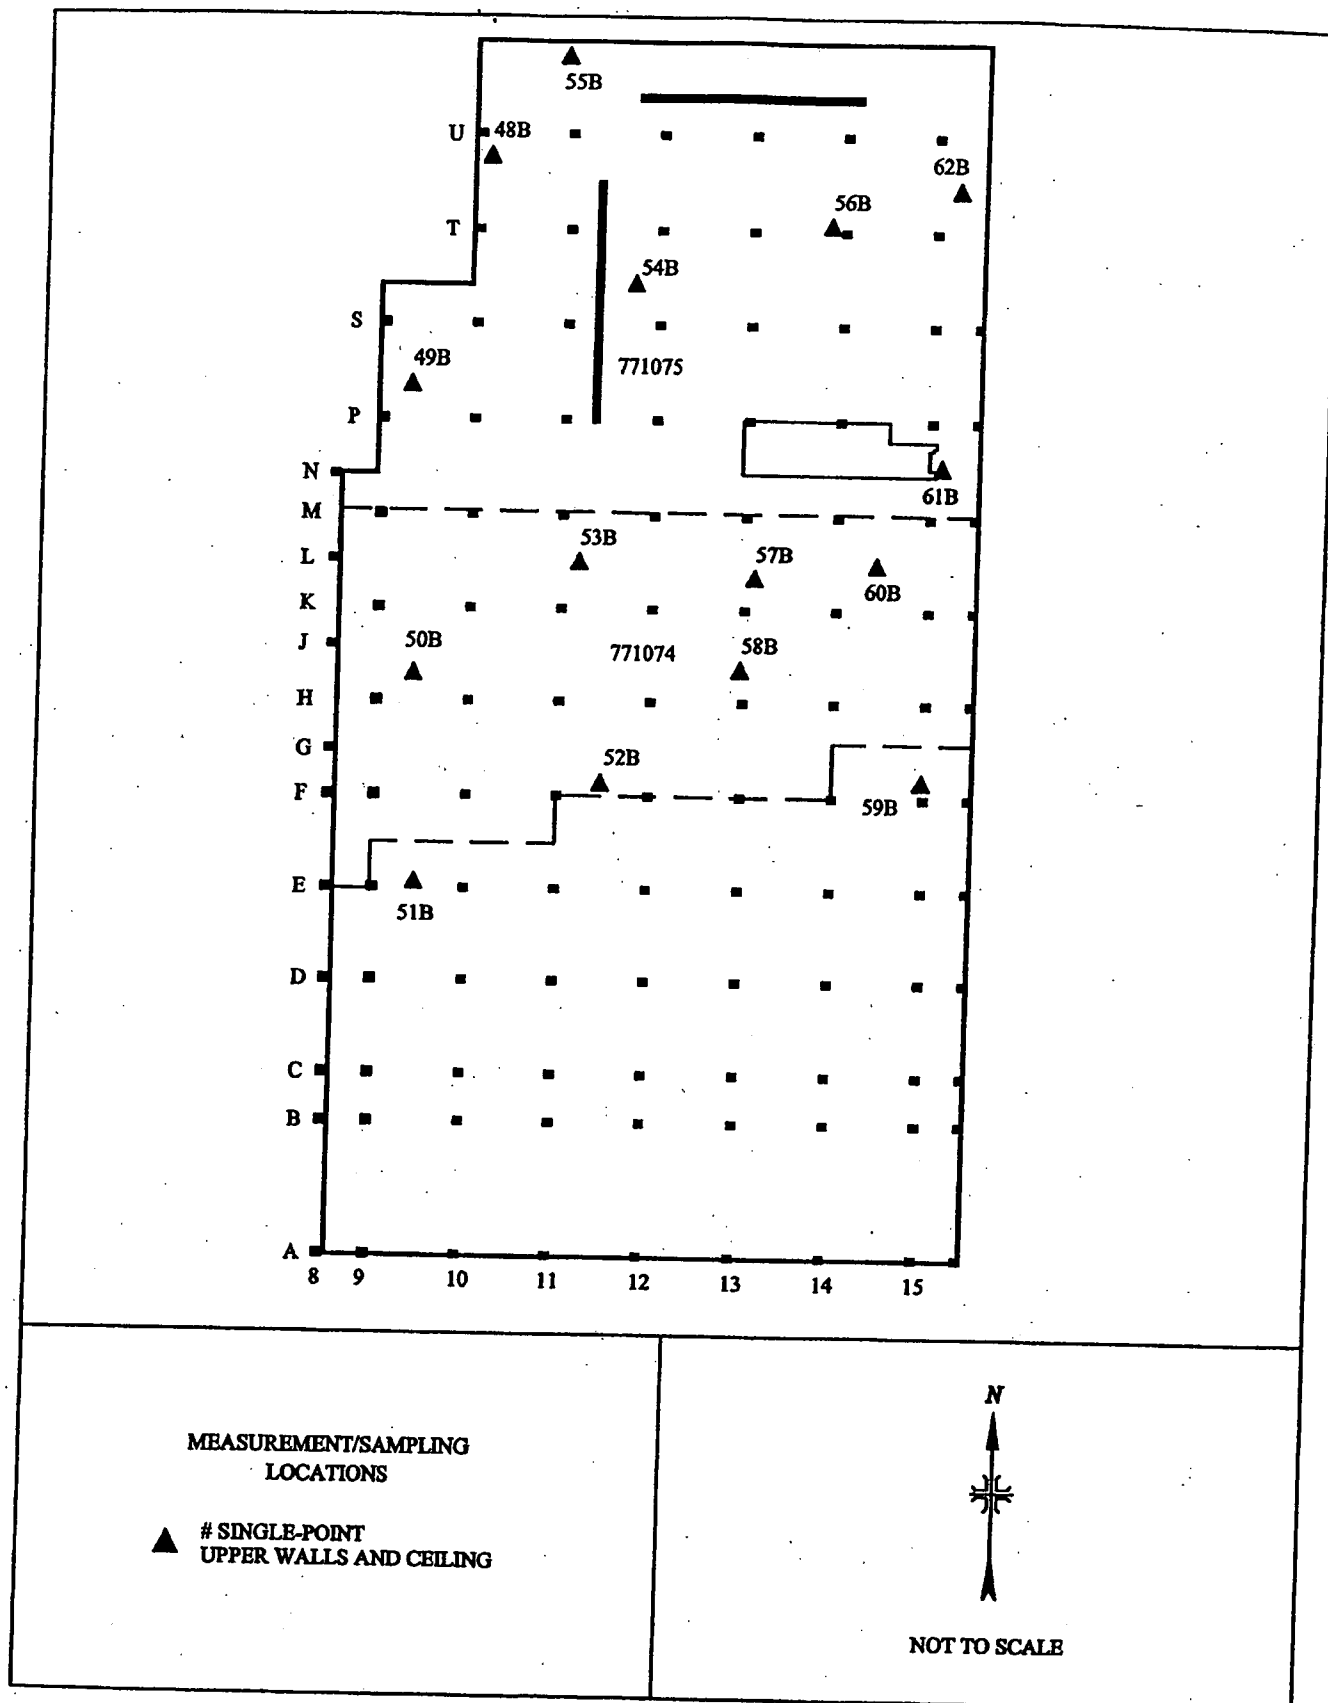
Building 771, First Floor, Area AE (Upper Walls and Ceiling) Measurement Locations
